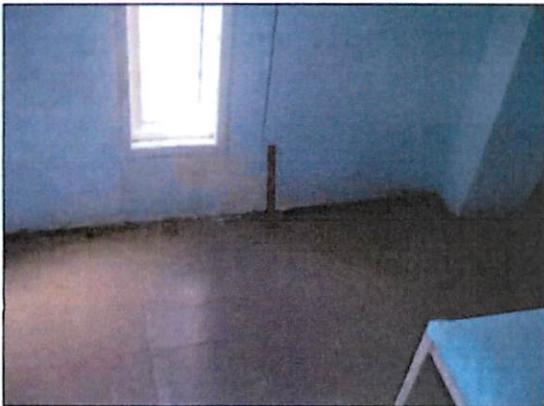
North wing, Room 6, evidence of previous wall repair/patch on exterior wall system
